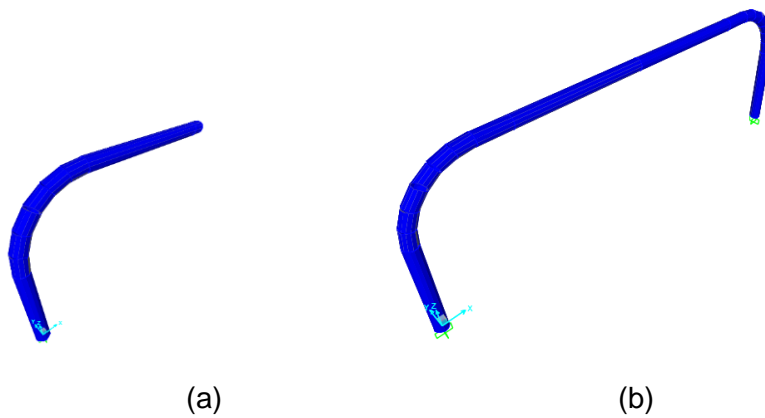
State of Delaware sign structure models: (a) cantilevered; and (b) bridge-type examples.
